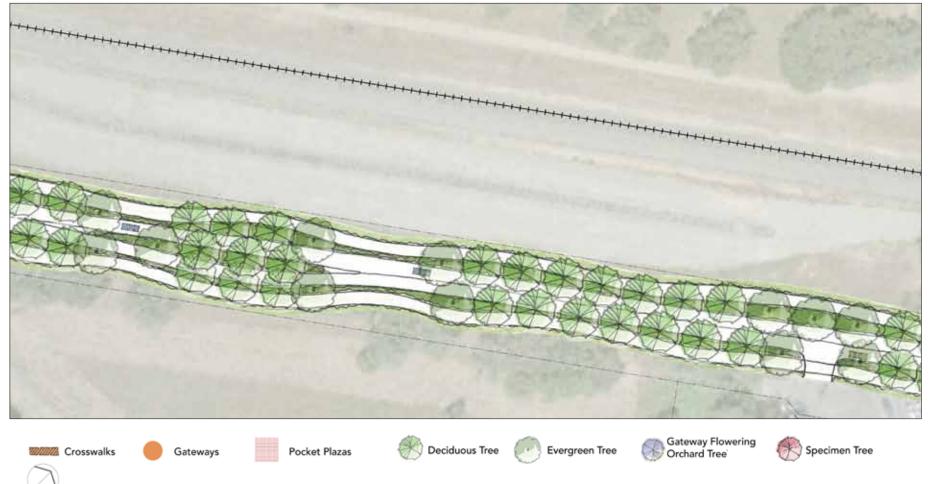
WEST GATEWAY CONCEPT PLAN
